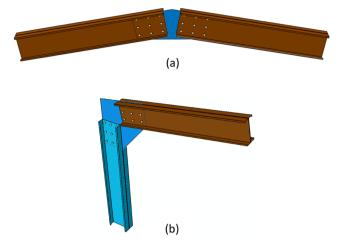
CFS (a) apex and (b) eaves connections with back-to-back beam sections used in typical portal frames.
